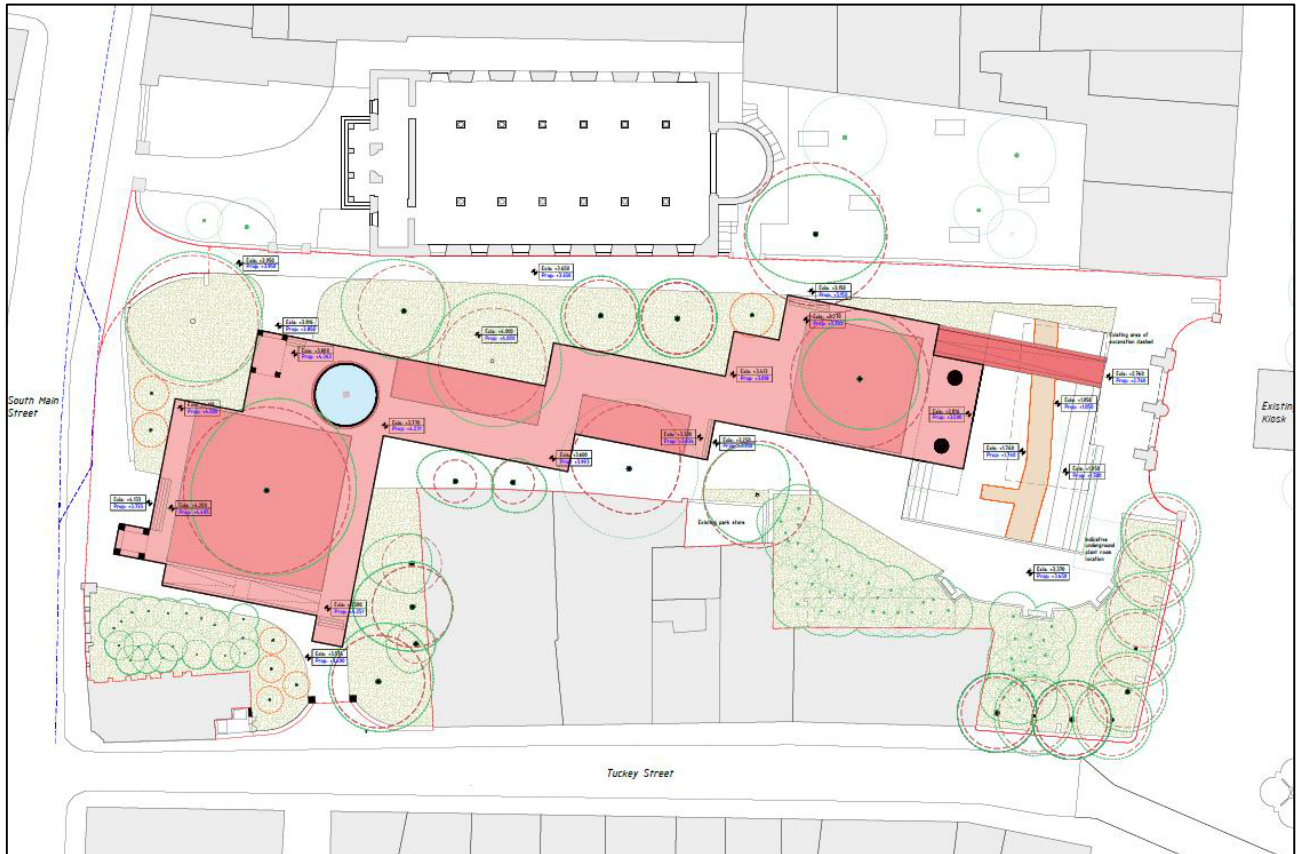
Layout of proposed development site (refer to accompanying documentation for full details)
